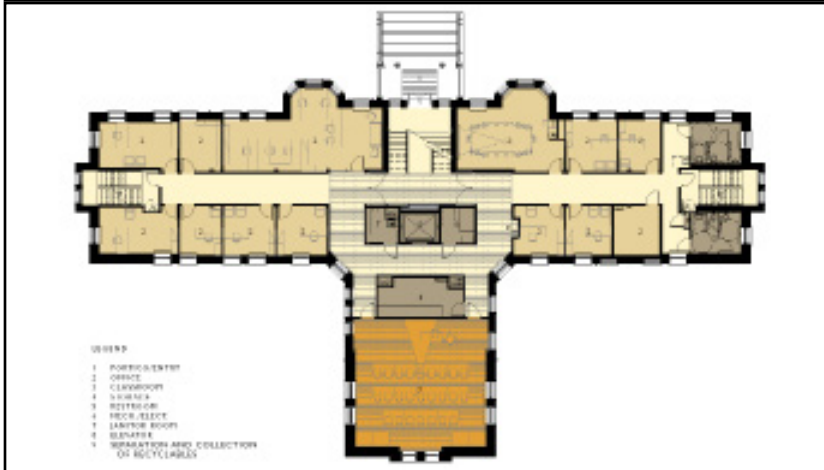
Clark Hall second floor plan from the 2009 renovation. Credit: Mahlum Architects, courtesy of UW CPD
